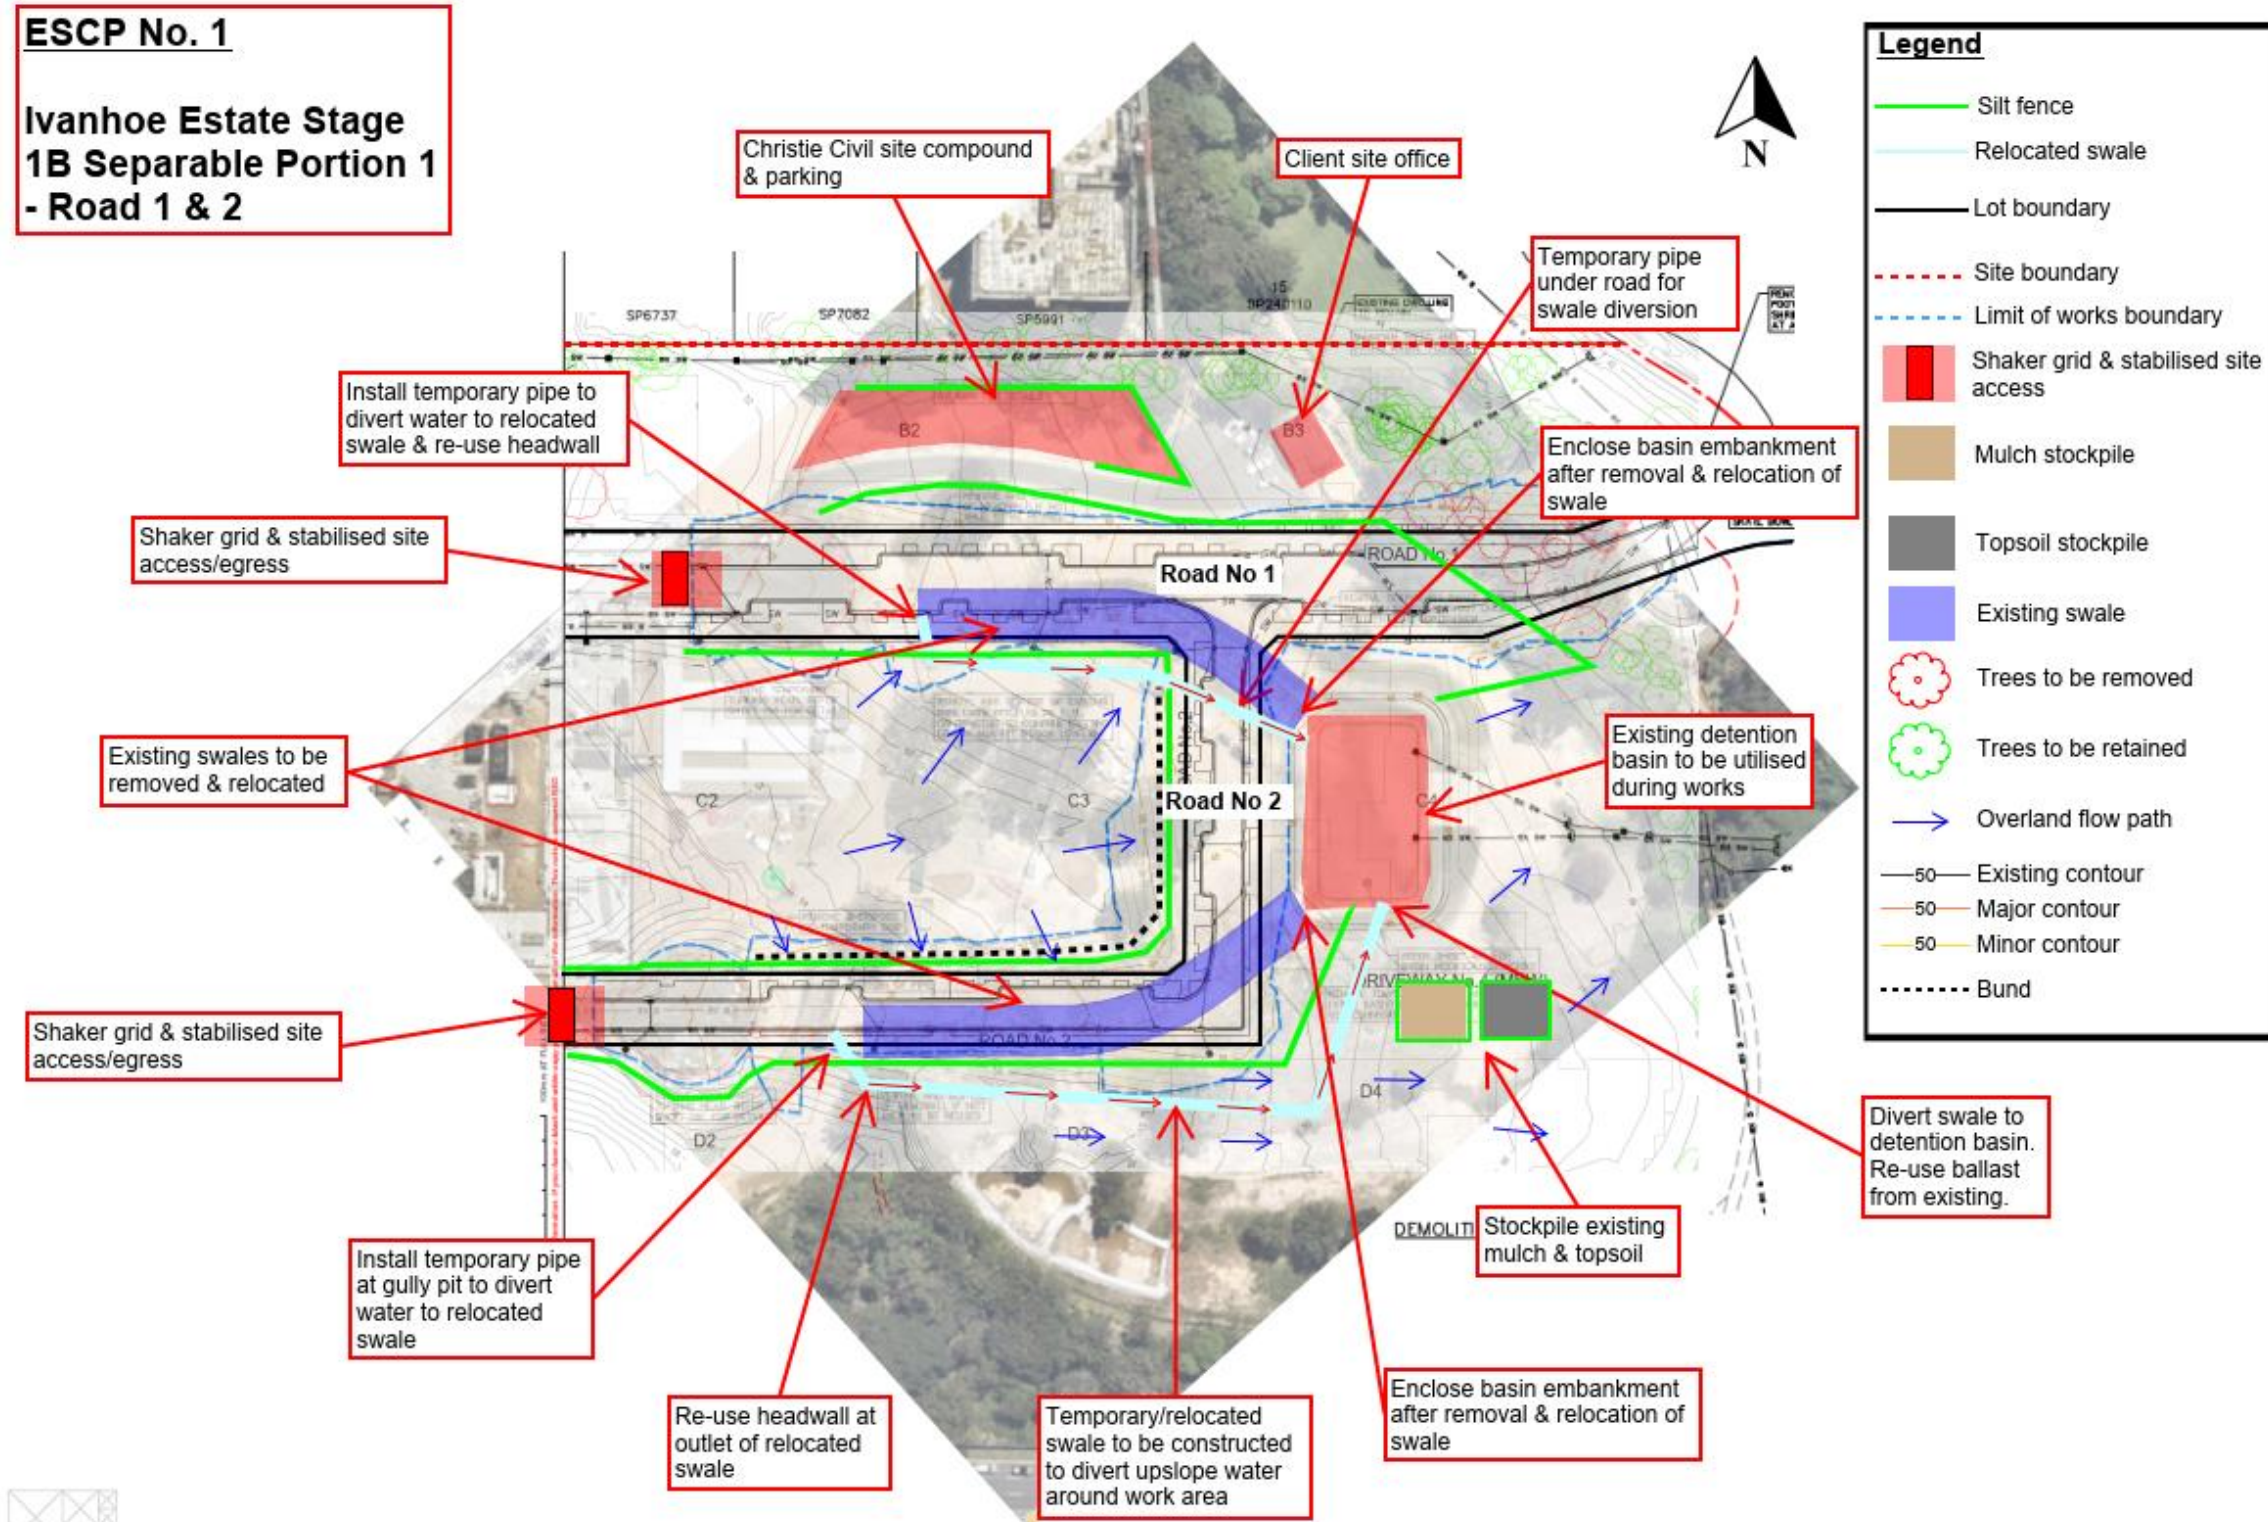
Plan View of Separable Portion 1 – Construction of Road No.1 & No.2
